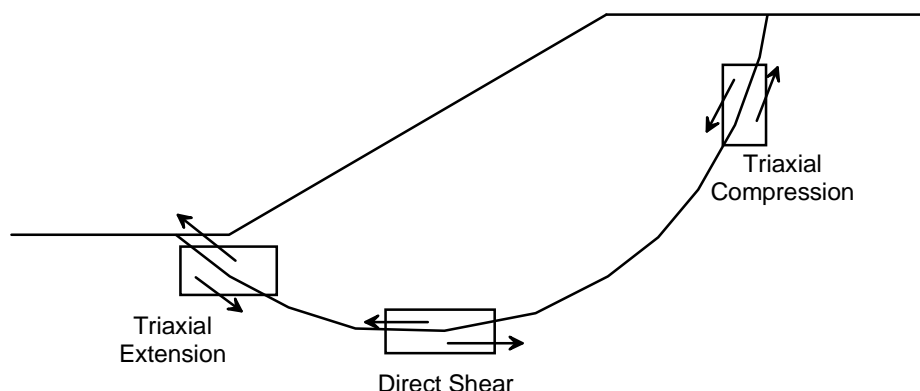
Modes of Shear Deformation Along Typical Failure Plane
